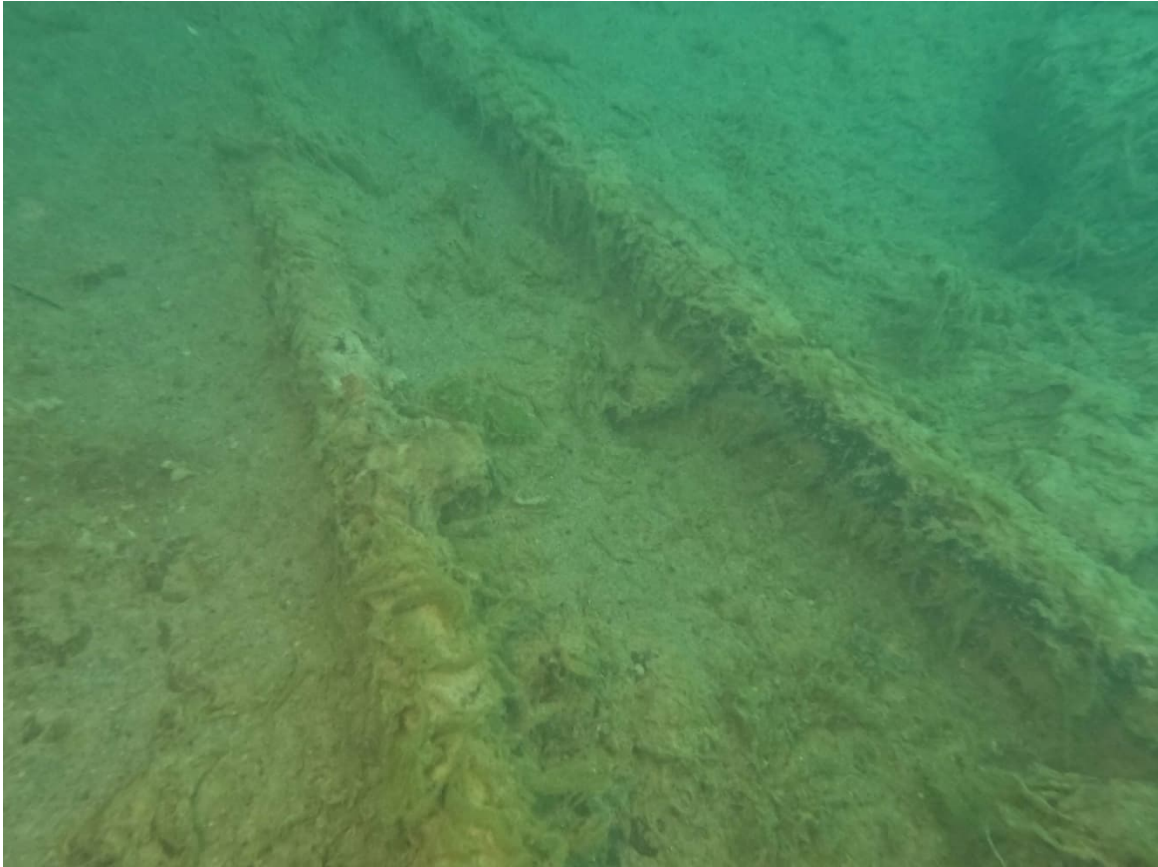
Example of exposed reinforcement on top of weir structure.
